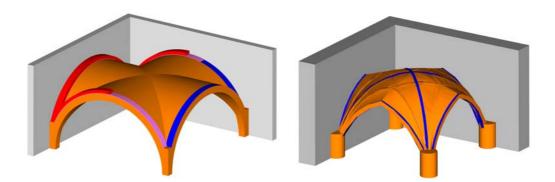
Example of FRP strips use in masonry vaults reinforcement ([3] fig. VO6)
